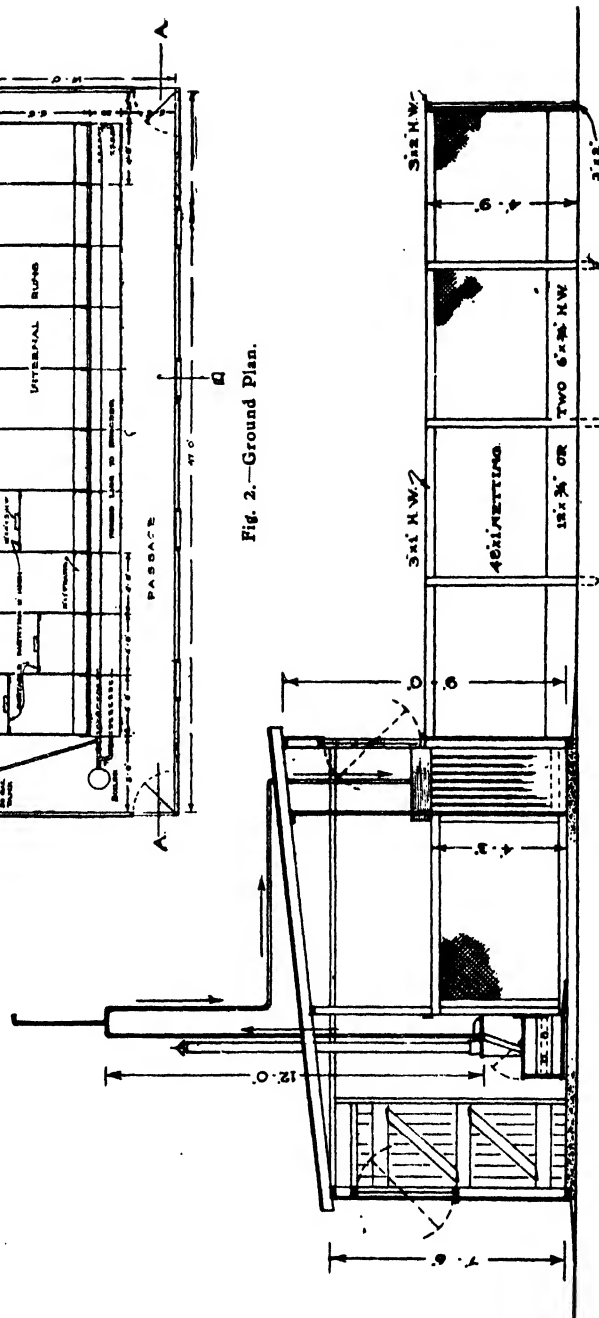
Section BB of Plan of Brooder House given in Fig. 2.
